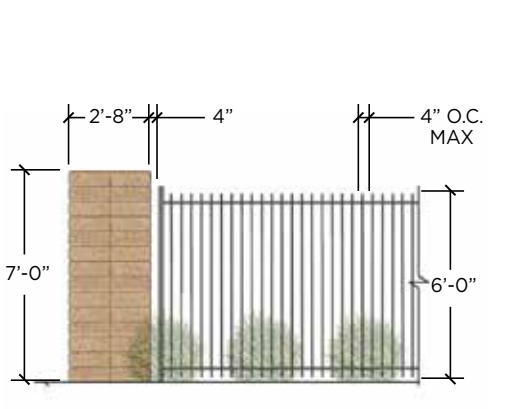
| CONCEPTUAL WALL ELEVATIONS
